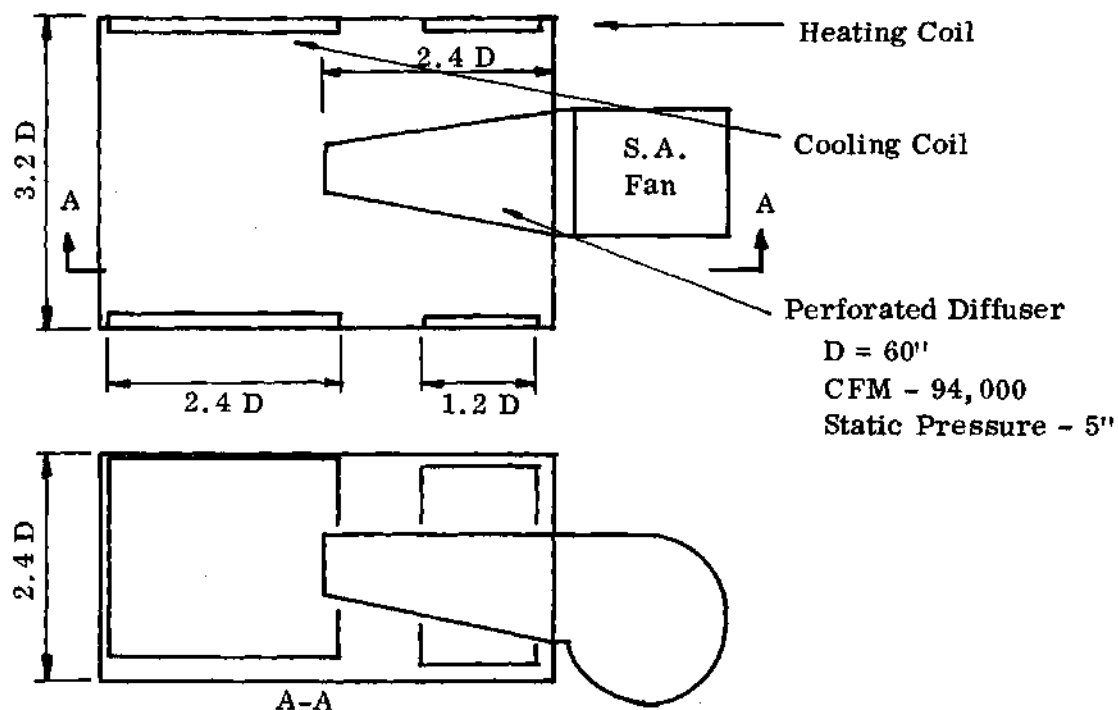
Building C, A Symmetric Fan Room Arrangement.
